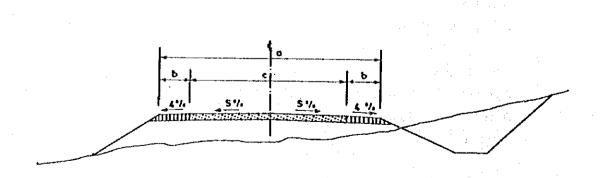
Cross Section Type II-VIII- Single Carriage Way
